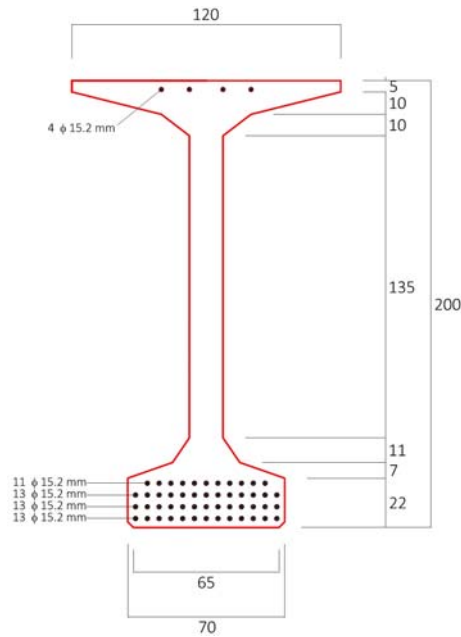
Dimensions (cm) and active reinforcement of the cross section.
